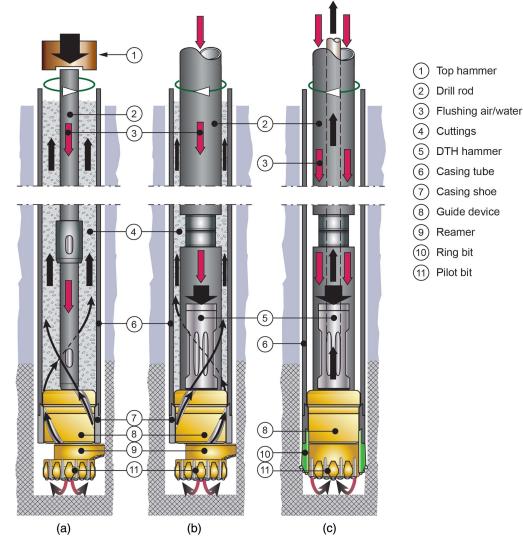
Rotary percussive duplex drilling methods and drill bits used for overburden drilling: (a) top drive (top-hammer) eccentric; (b) DTH hammer eccentric; and (c) reverse circulation (RC) DTH hammer concentric.
